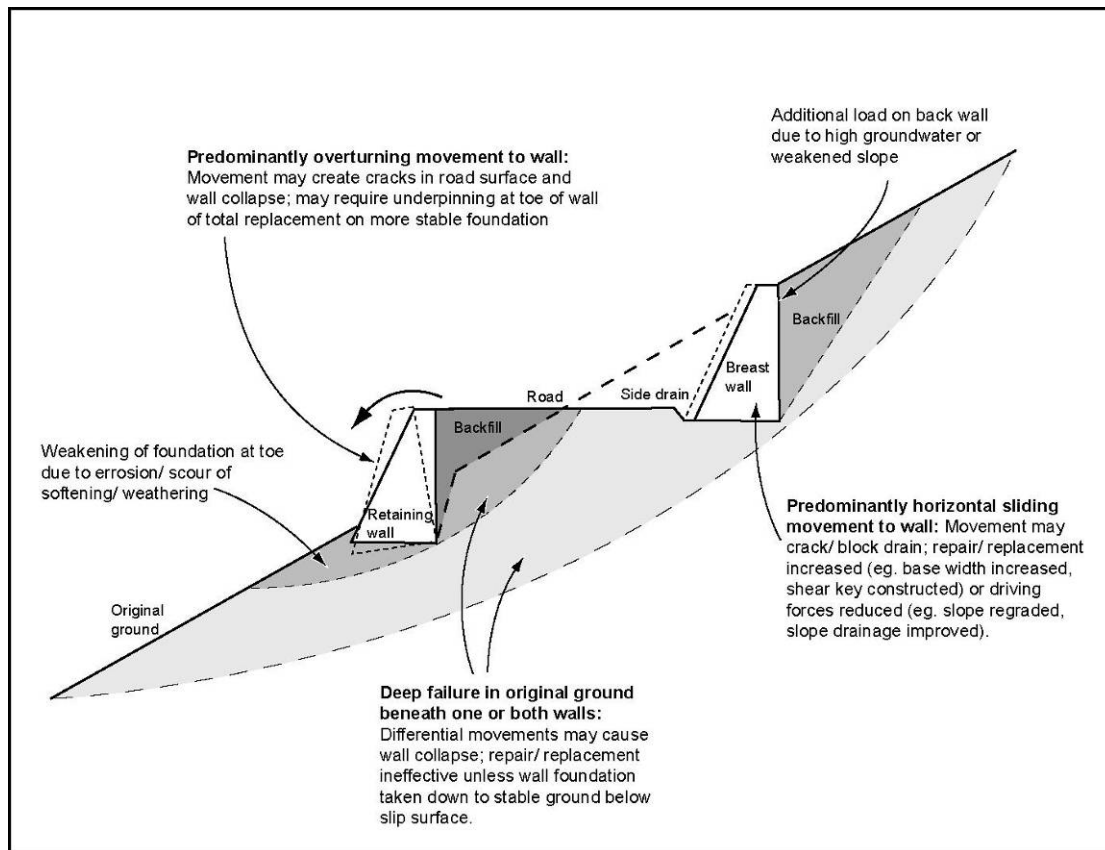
Failure of mortared masonry wall due to large scale slope movement
